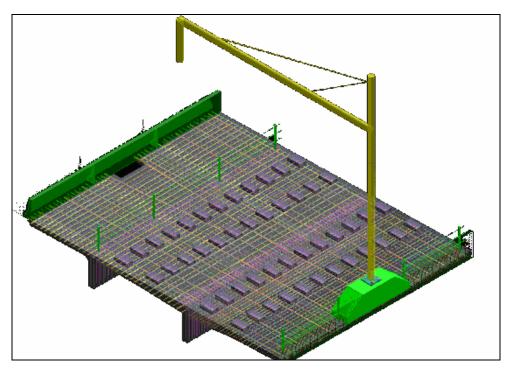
Two-Track OCS Cantilever Structure (Parsons and INCA [1])
